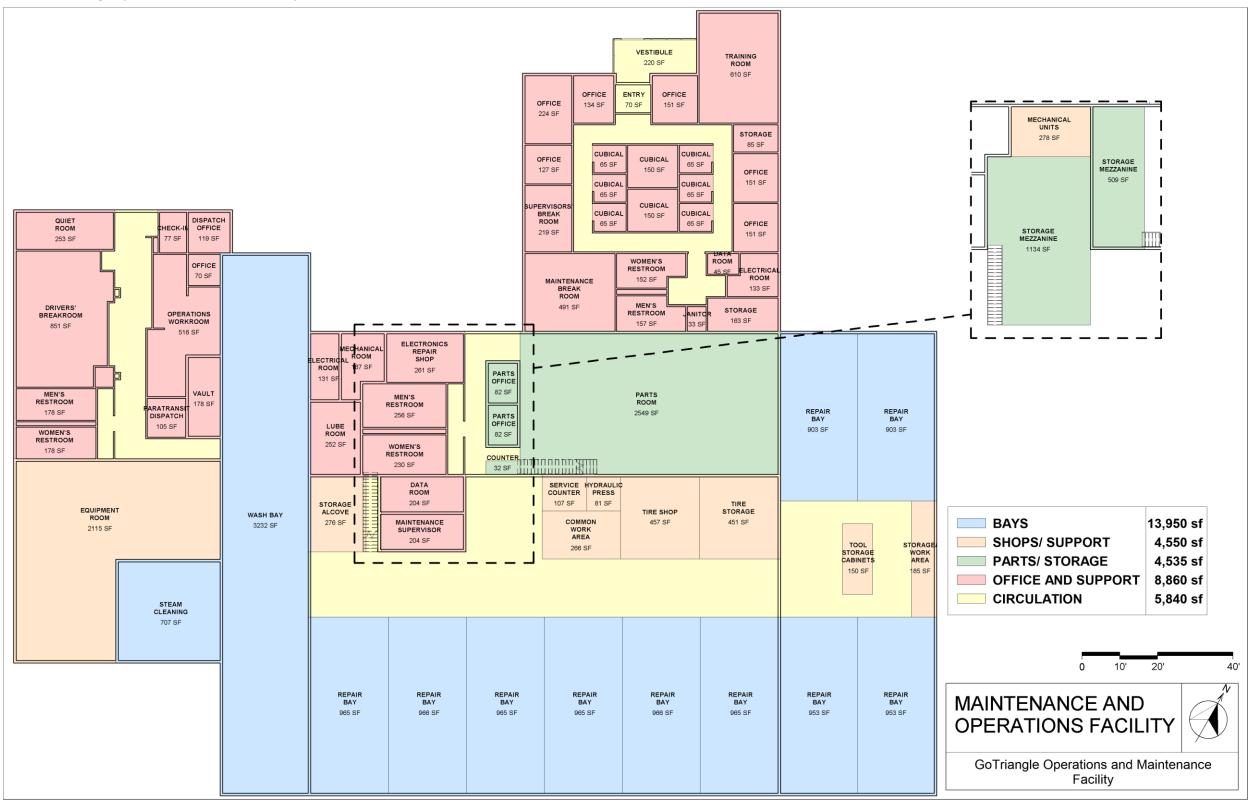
Exhibit AL: GoTriangle Operations and Maintenance Facility Floor Plan
